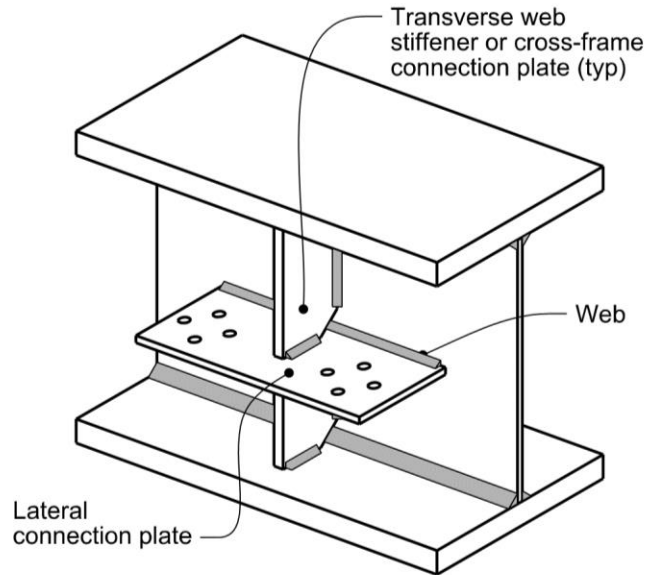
Intersection of a continuous lateral connection plate with the girder web and a discontinuous transverse web stiffener.
